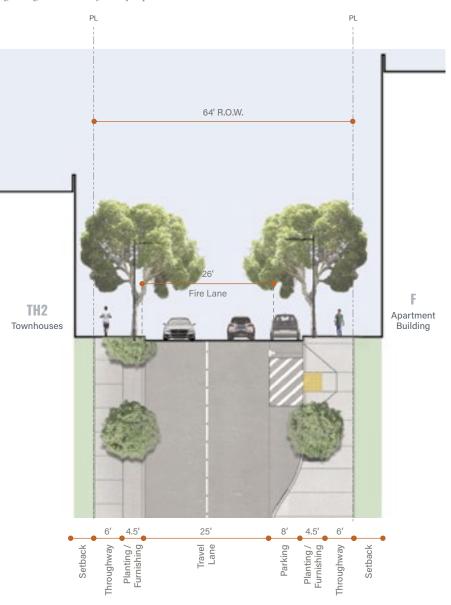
West Street, Section 1 *see "Figure 5.15-2: West Street, Site Plan W.2 & W.3".
